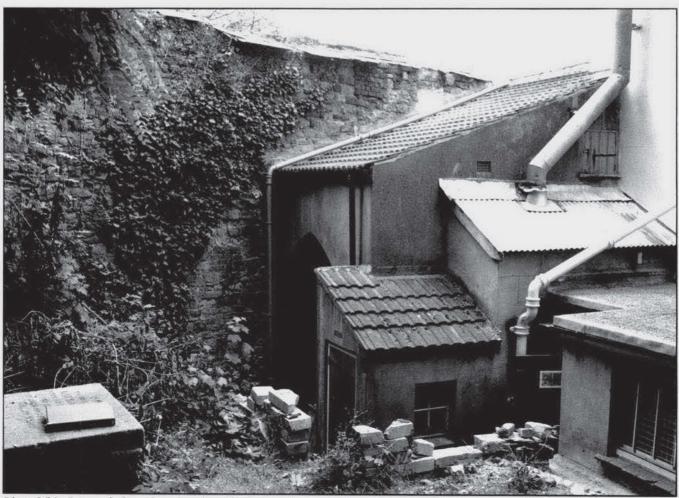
(b) Internal elevation showing blocked embrasures above lean-to roof of vestry, looking south.
